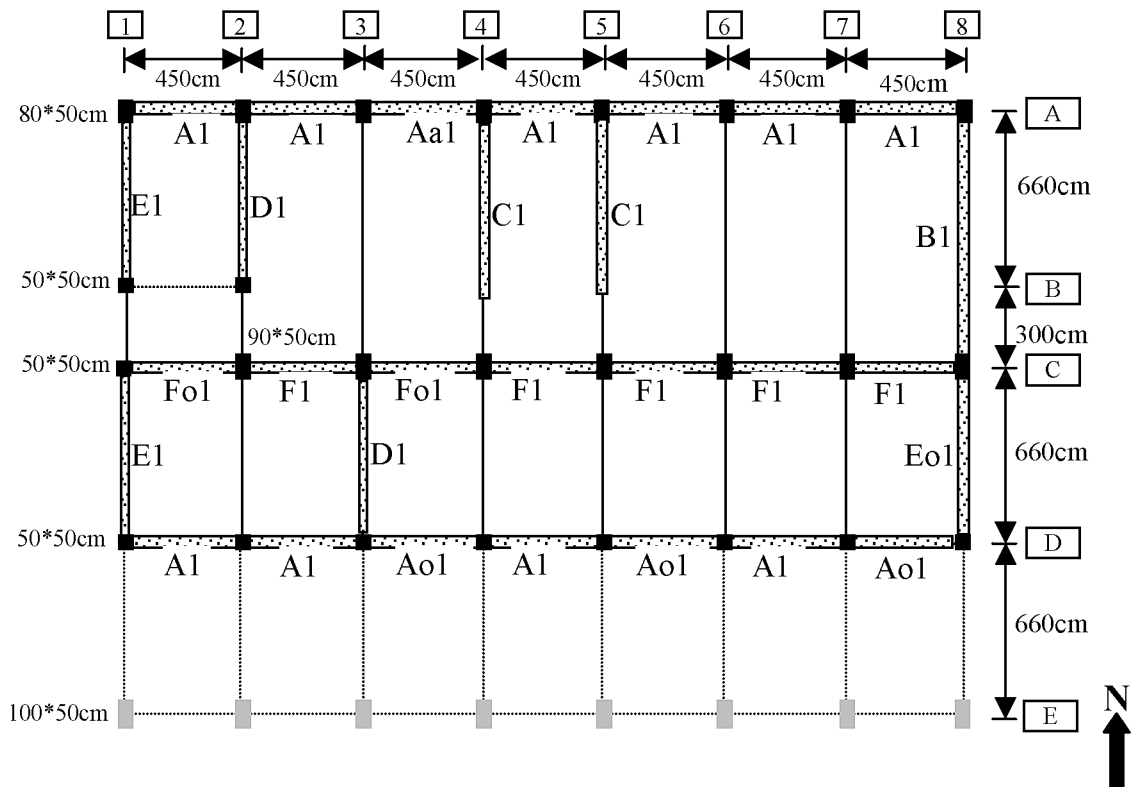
a. Plan of Basement, Columns and Infill Walls.
